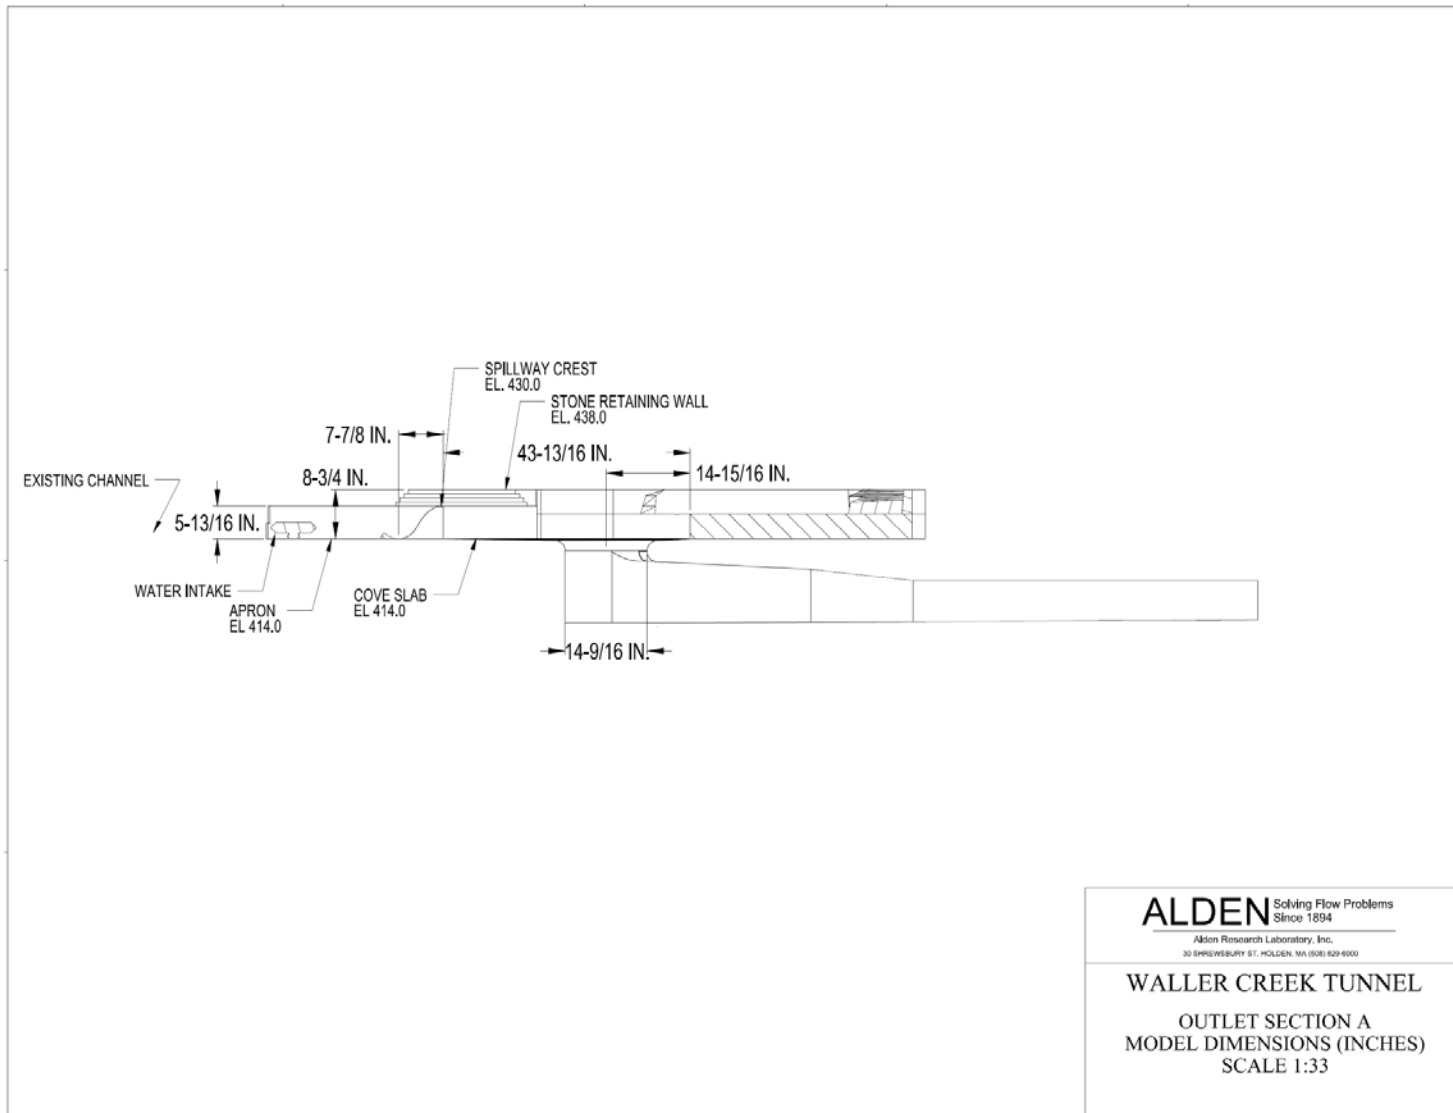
Waller Creek Tunnel Project; 1:33 Scale Model Outlet Dimensions –Section A
